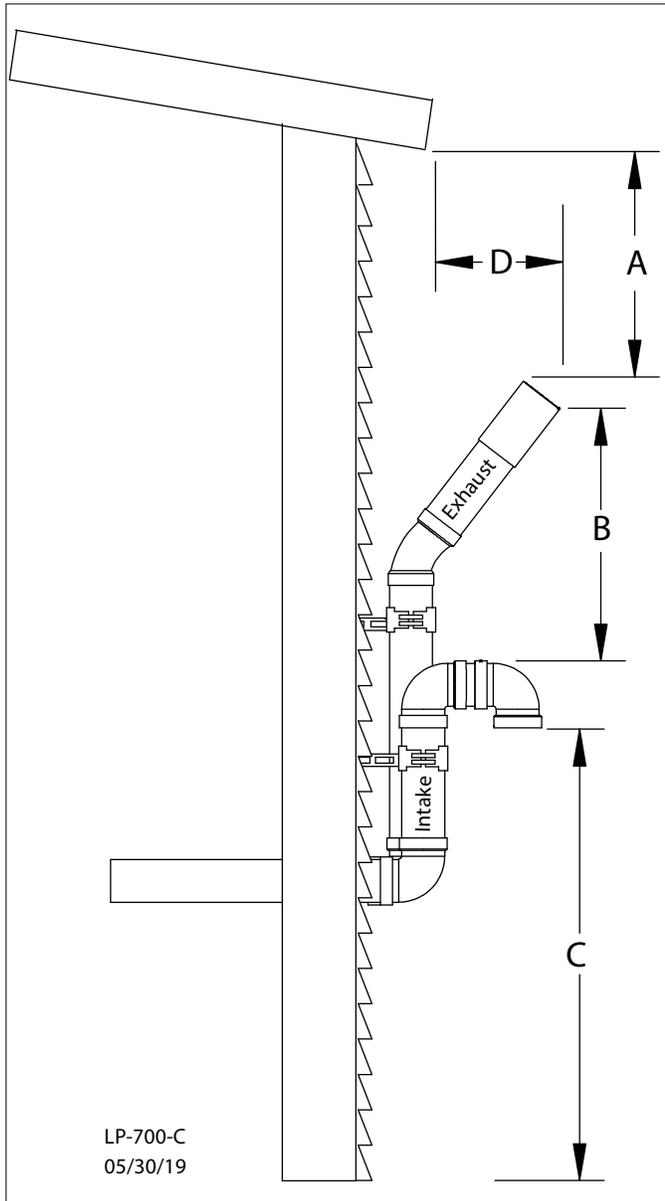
Two Pipe Sidewall (Horizontal Snorkel) Venting
